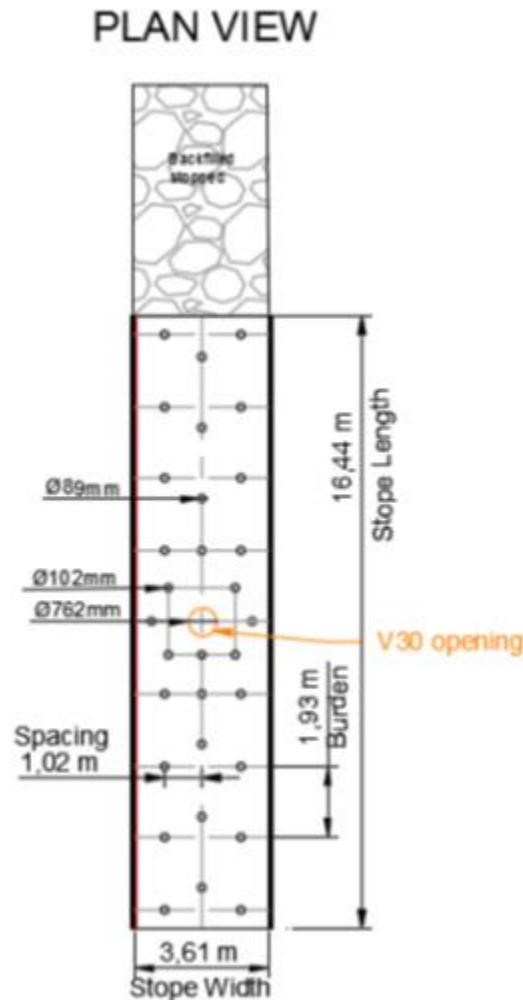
Typical drilling configuration for Valley Zone, plan view
